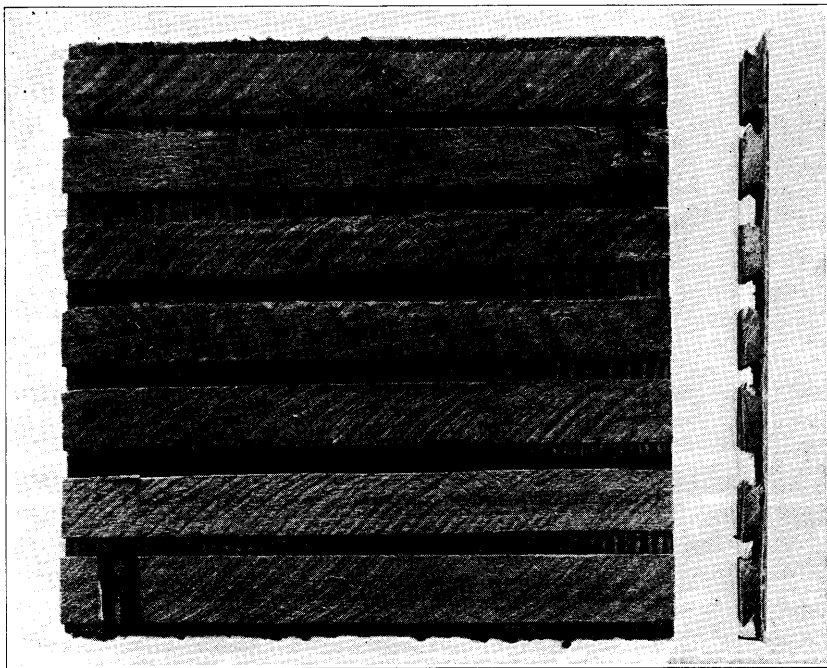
MATERIAL H—BEVELED LATH MOUNTED ON CHEMICALLY TREATED CARDBOARD
